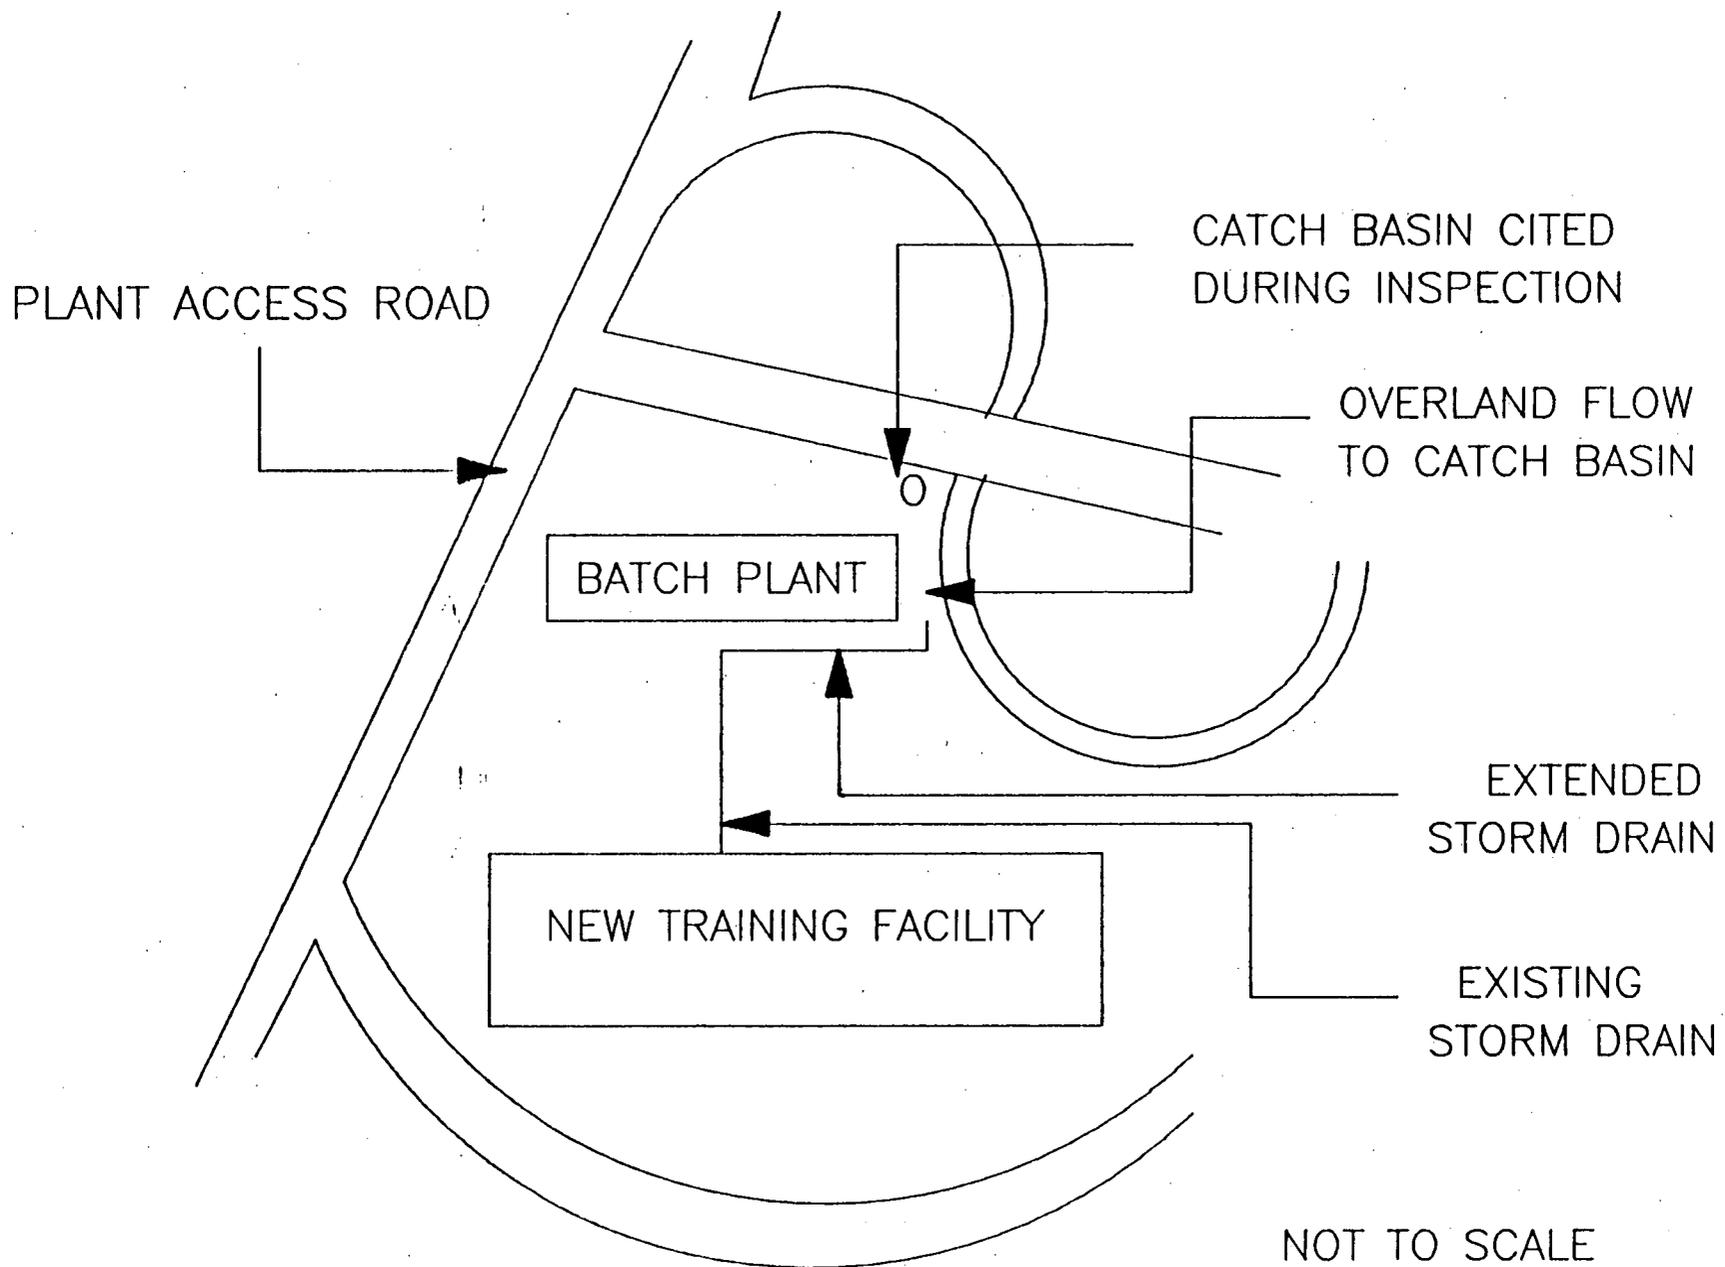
WATTS BAR NUCLEAR PLANT – CONCRETE BATCH PLANT DRAINAGE
